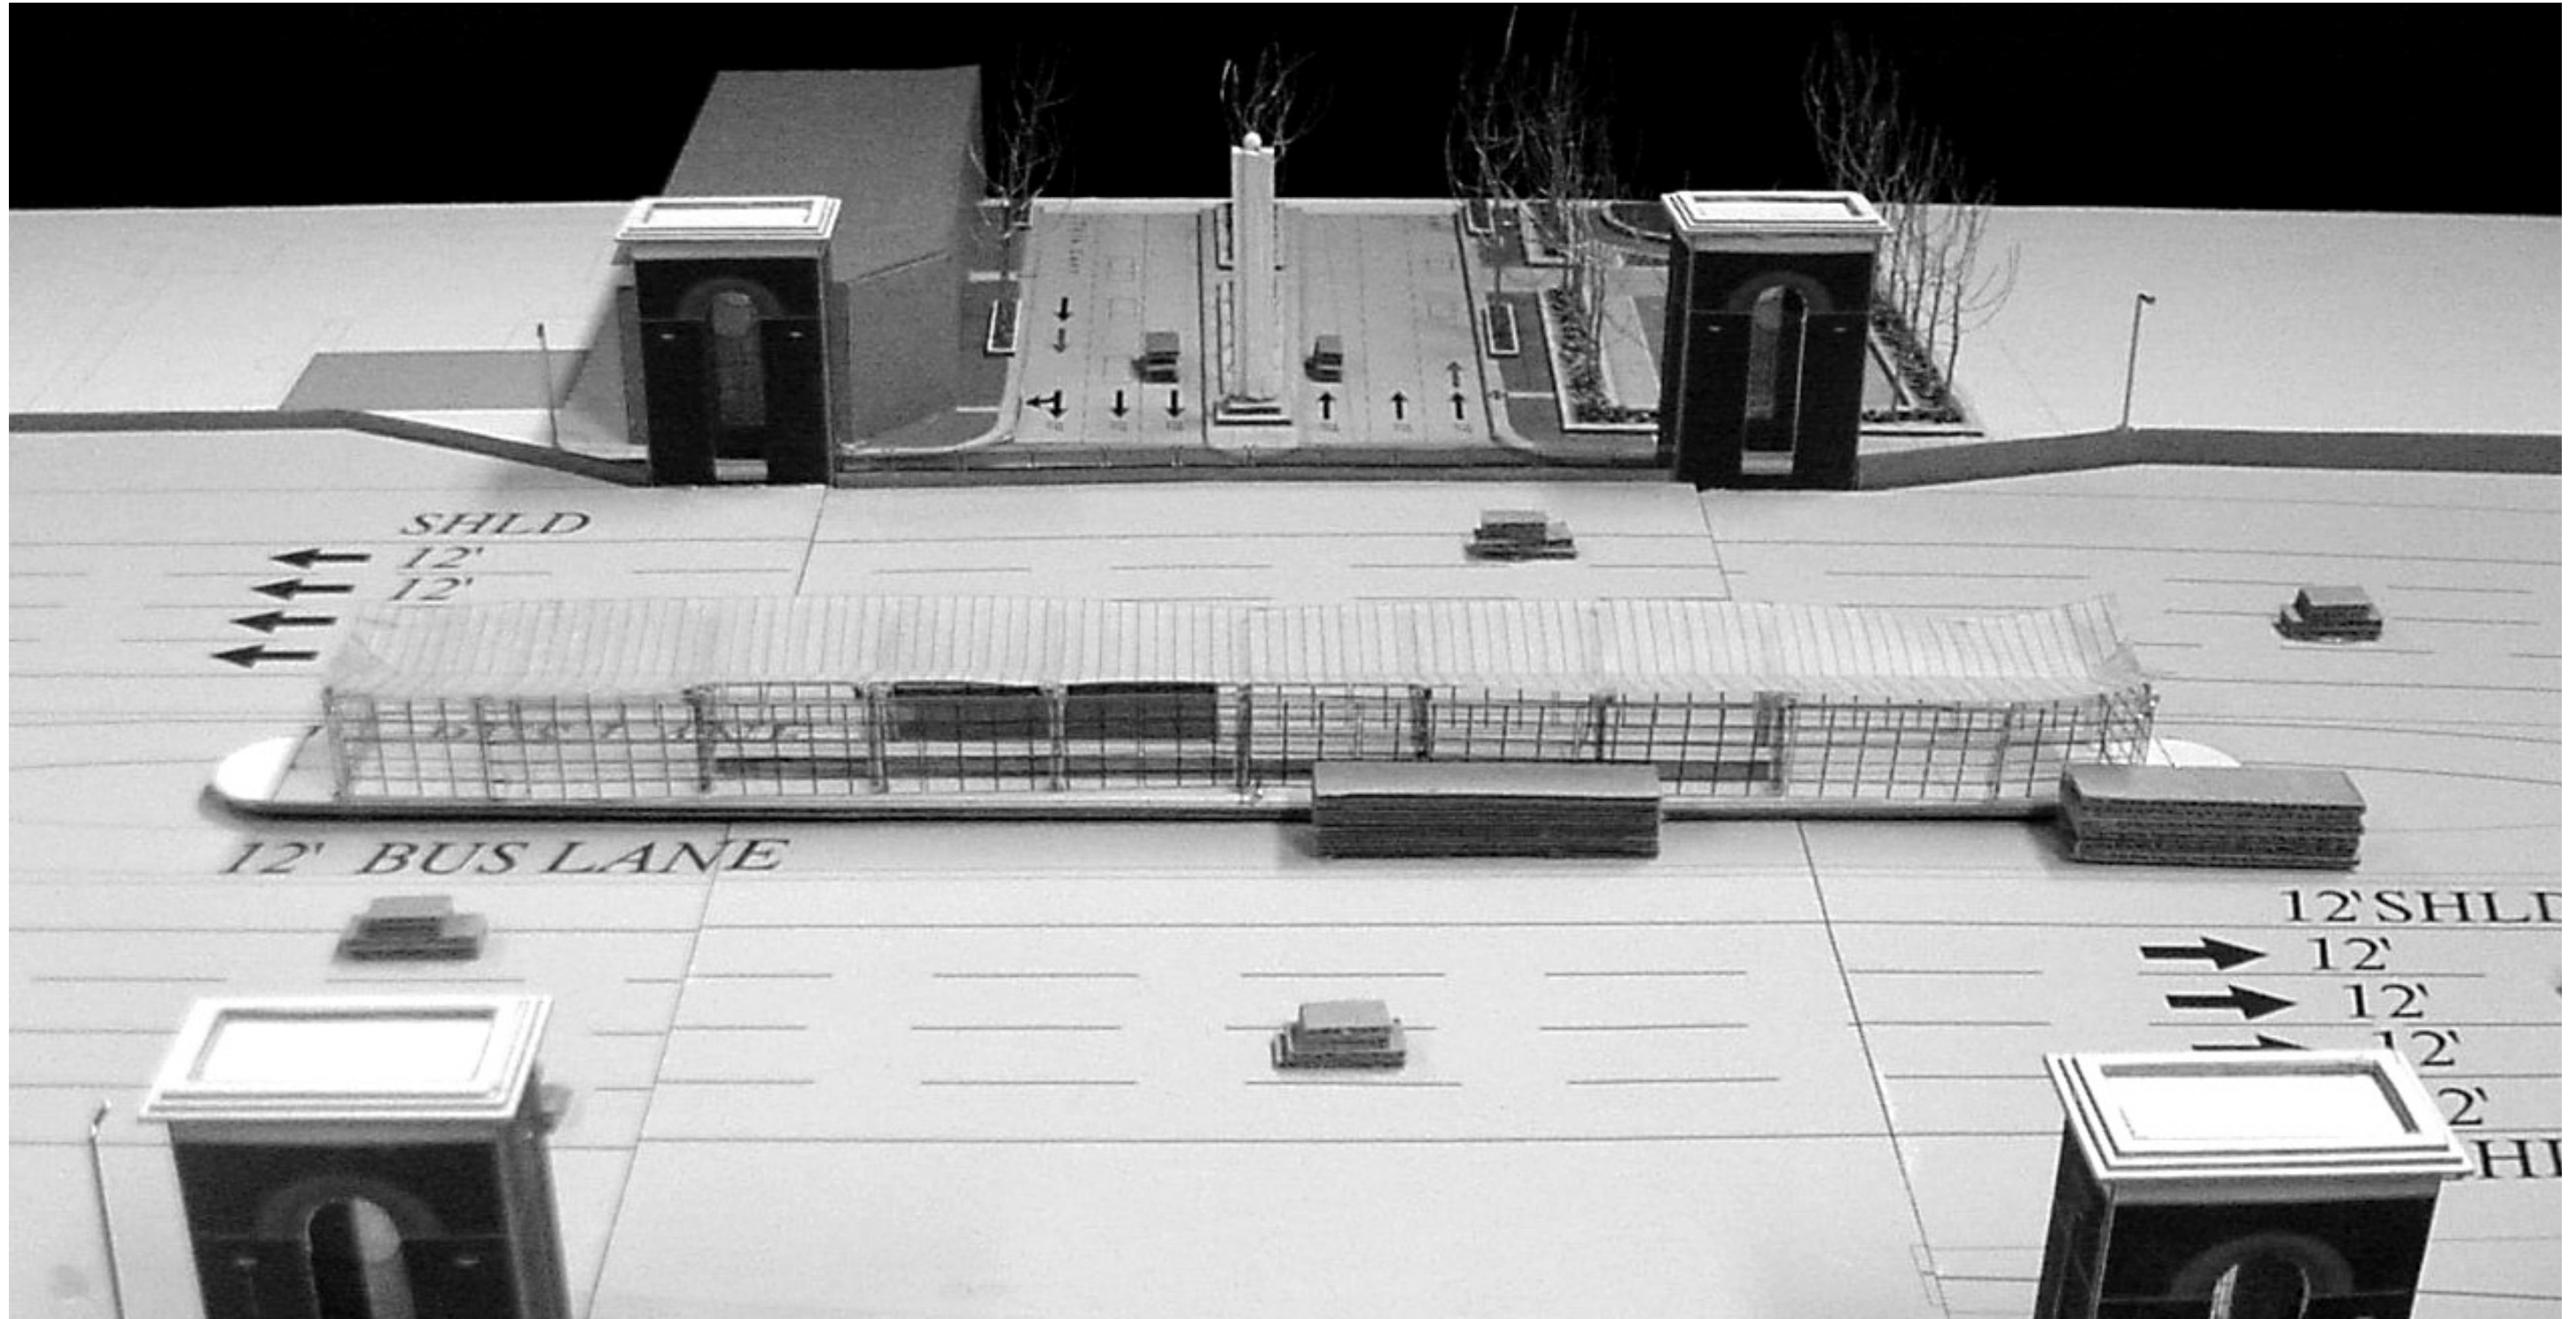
B: I-35W and Lake Street Transit Station Model. A photograph of a study model of the proposed transit station on I-35W at Lake Street. Access to the transit station would be by elevator or stair from either side of Lake Street.
